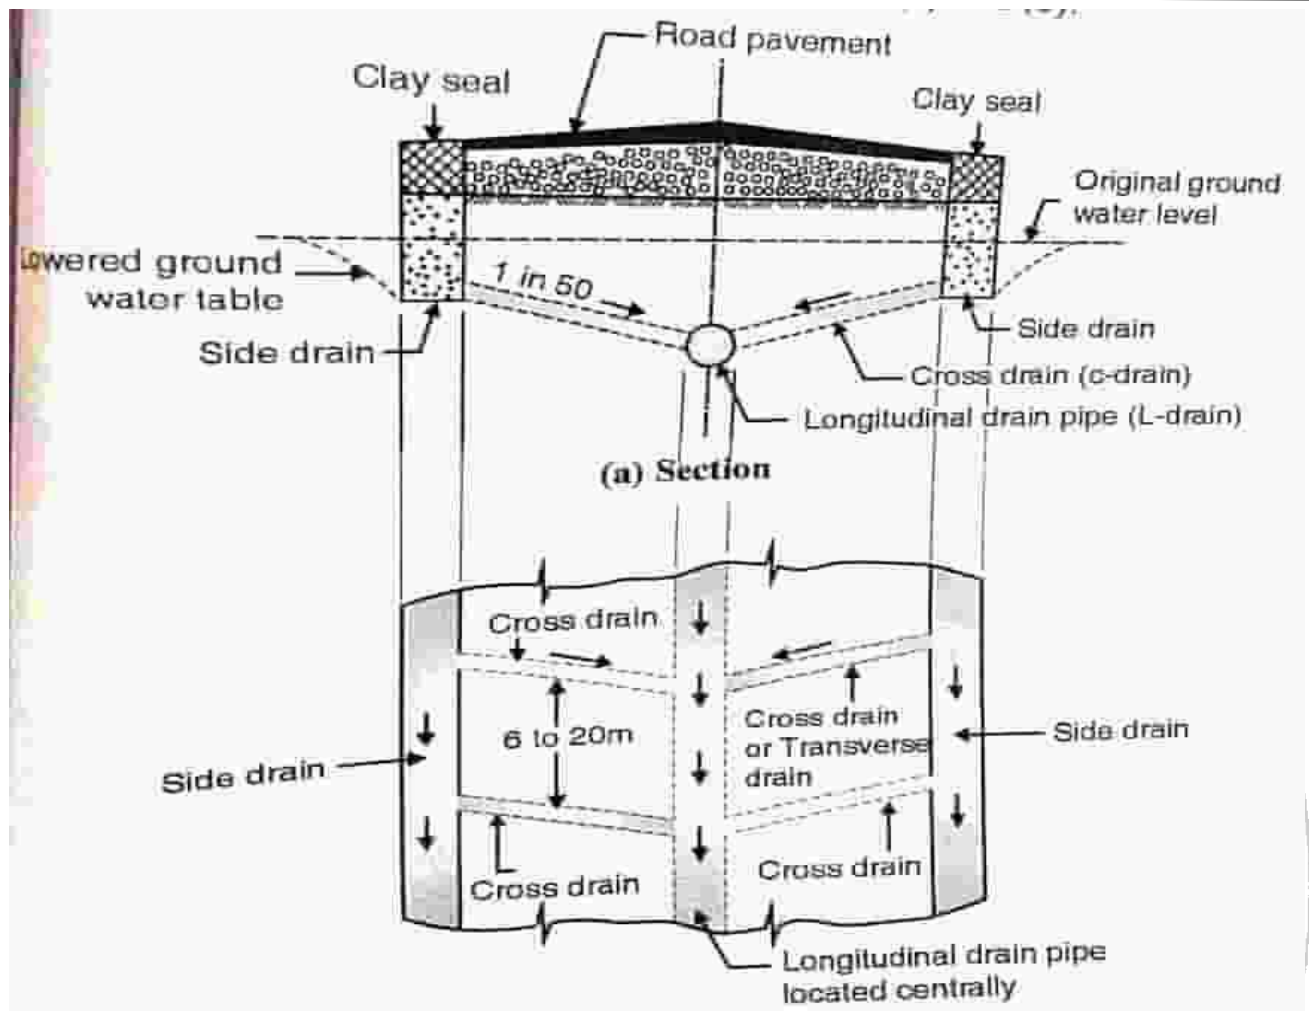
Sub- Surface Drainage System with Transverse Drains
